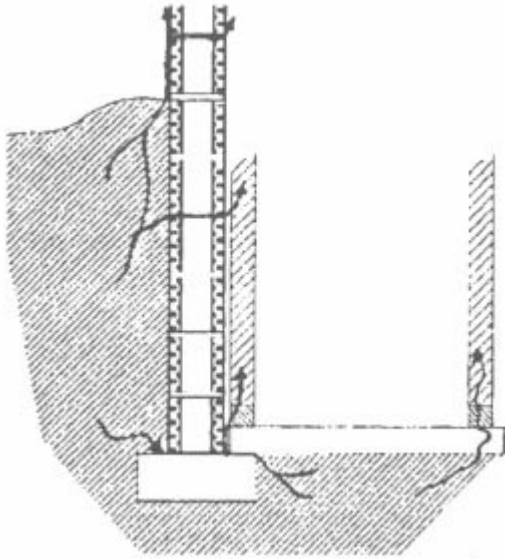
Basement construction, with arrows indicating potential entry points for termites
